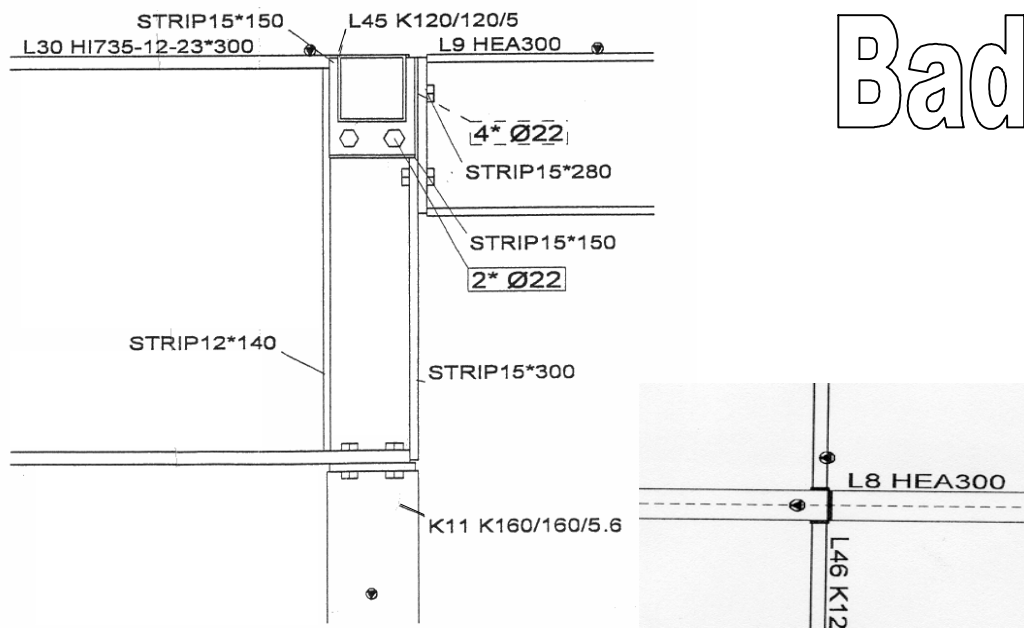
Simple beam to column joint, beams of open cross sections, column RHS tube; unsuccessful case - danger of instability during erection and an expensive solution
